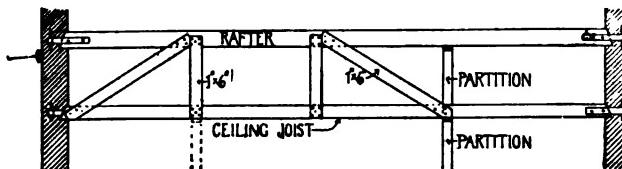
Suspended Ceiling, Trussed. Western Method.
